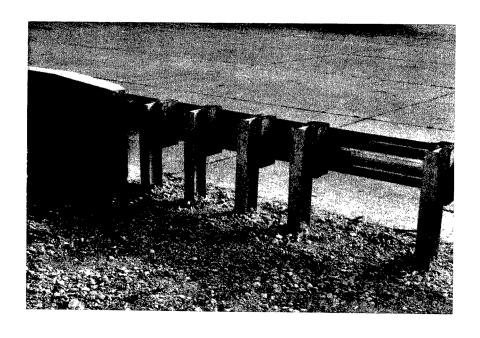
Cross-section of W-beam transition (on steel posts with timber blockouts).
